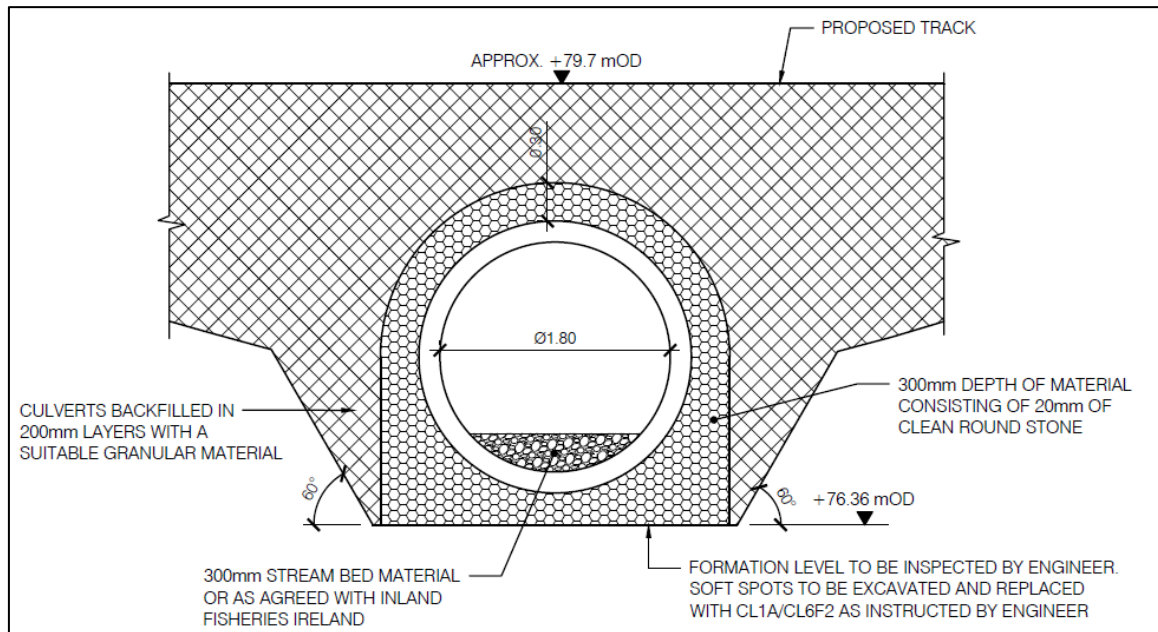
Proposed Stream Crossing (Section A – Figure 5)
